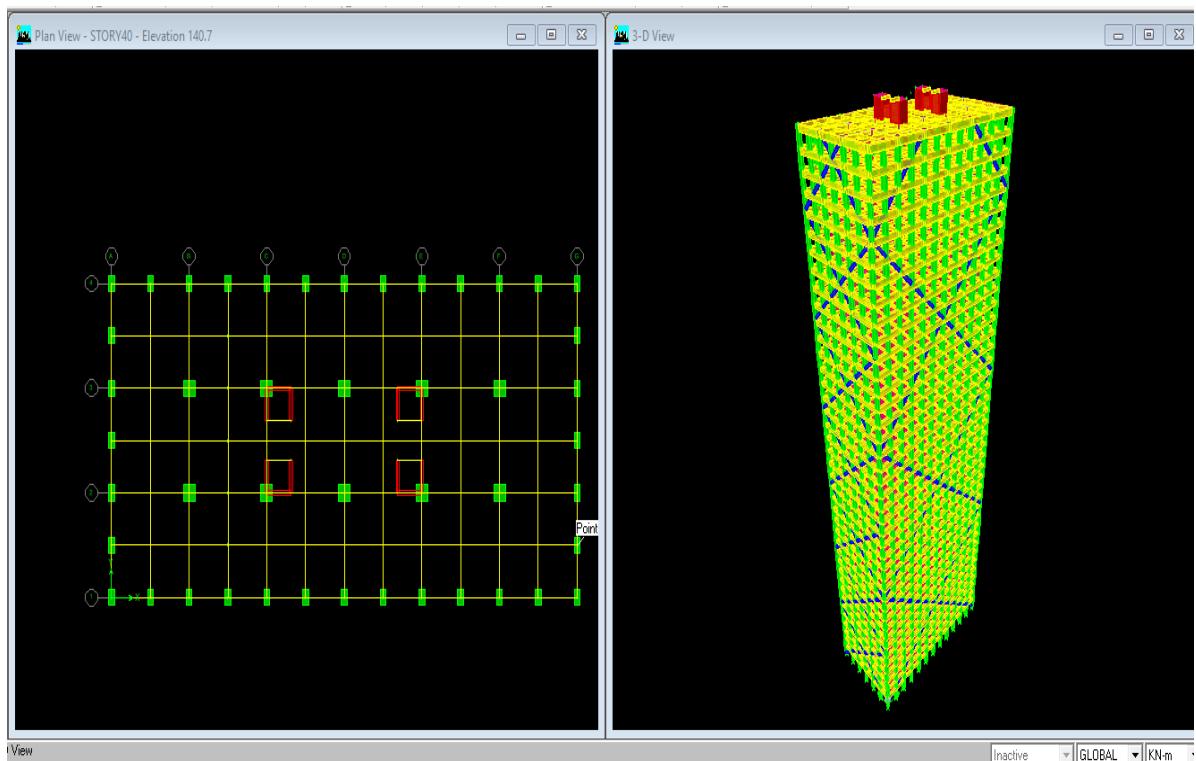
Plan view and 3-D view of 40 storied Braced Tube structure building
